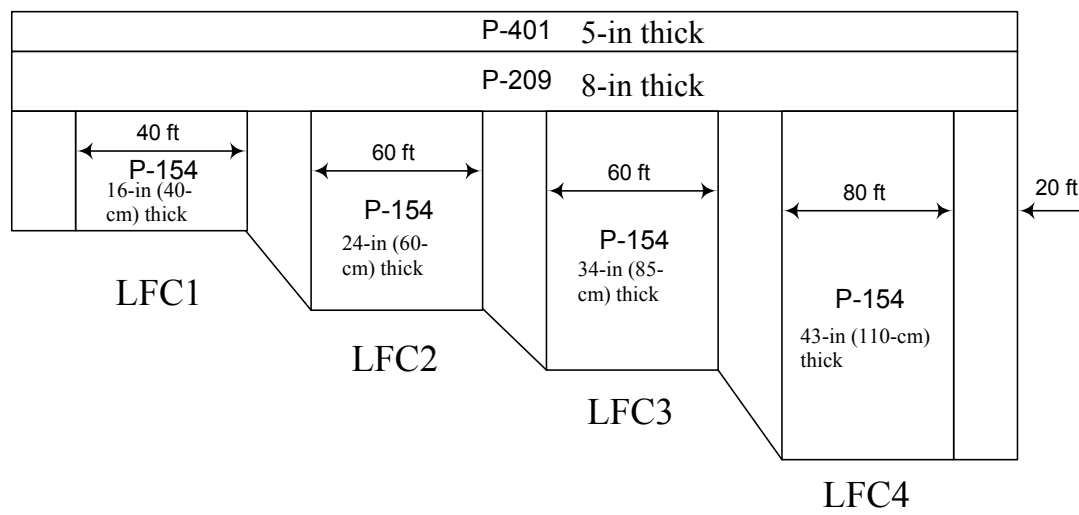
Cross-sectional layout of the LFC-1 through LFC-4 pavements.
